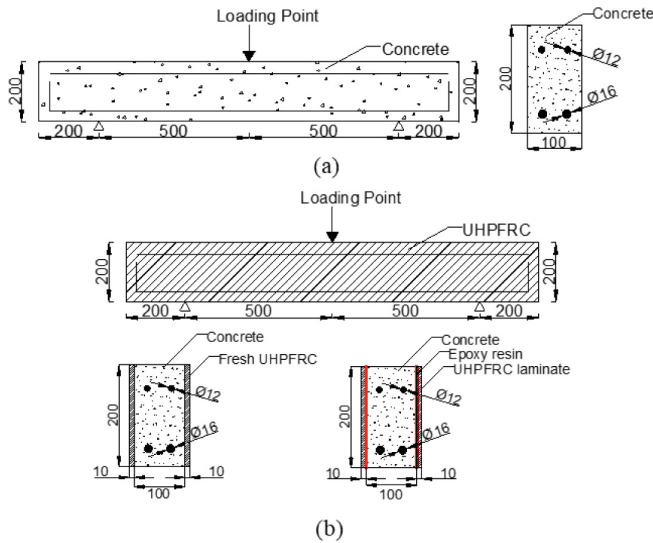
Specimen configurations: (a) RB beam; (b) ST beam (Unit: mm).
